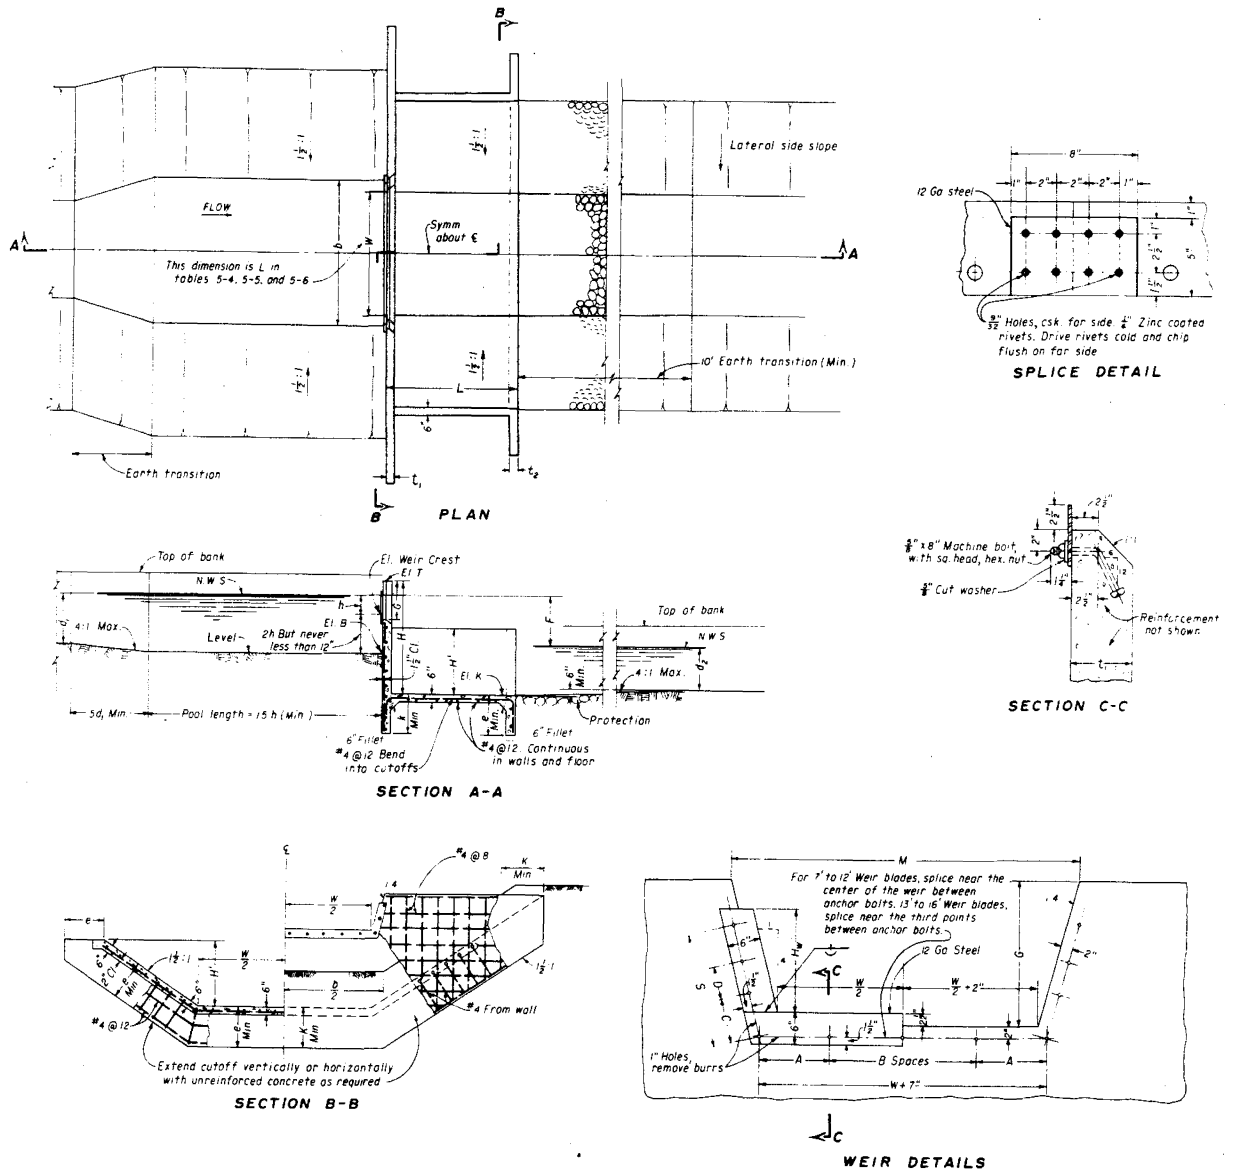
Cipolletti weir structures—12 inches to 4 feet. 103-D-1237
